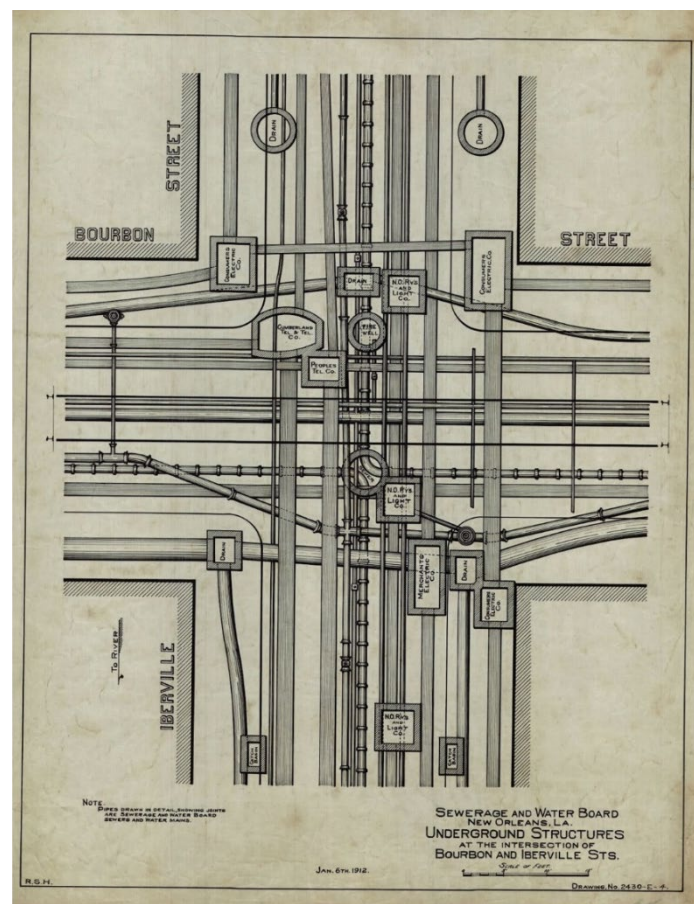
1912 Plan detail of underground utilities in New Orleans. Image by The Sewerage and Water Board of New Orleans.
